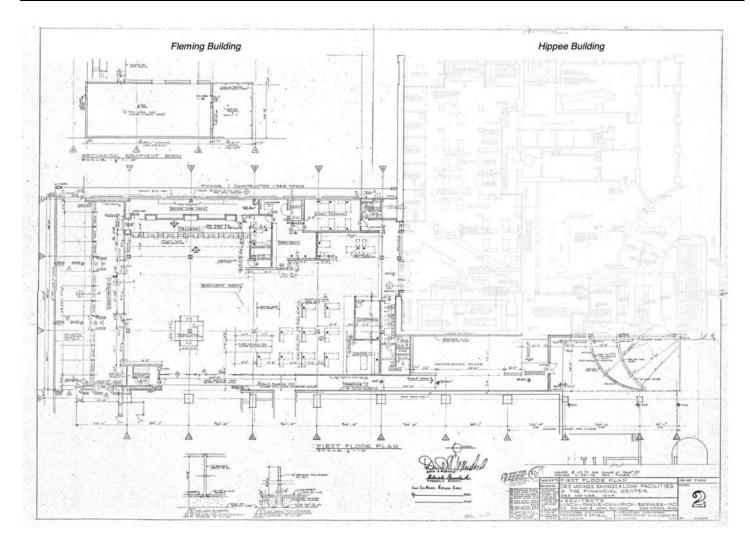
Historic drawing of Financial Center Office Building east wing first-floor plan, oriented with plan north at left, revised 1973. The drawing shows the east wing vestibule, Des Moines Savings and Loan Association banking hall, eastern extent of the shared central lobby, and shared rear east egress corridor. Inset near the top is a mechanical room plan. This drawing is the only surviving east wing drawing page and includes signature signoffs by the developers and both banks. (Financial Center Office Building drawings, Lynch, Payne, Champion, Bernabe, Inc., with labels added 2023).
